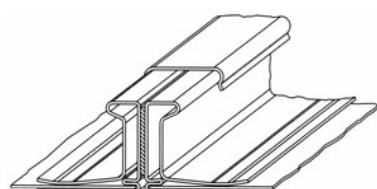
Close up cross-section of a flange for connecting two rectangular ducts. Cleat slides on the top to hold the two flanges together.
